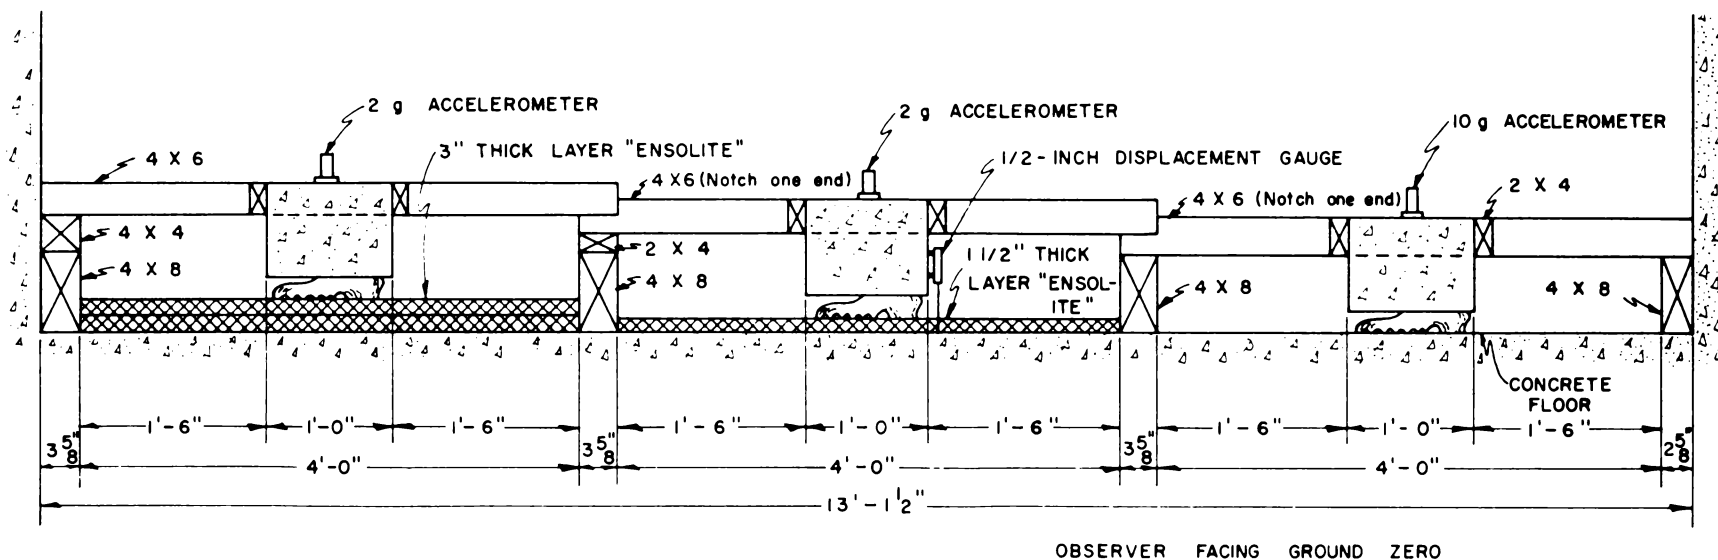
Cross-sectional view of instrumented test blocks held in wooden frame.
